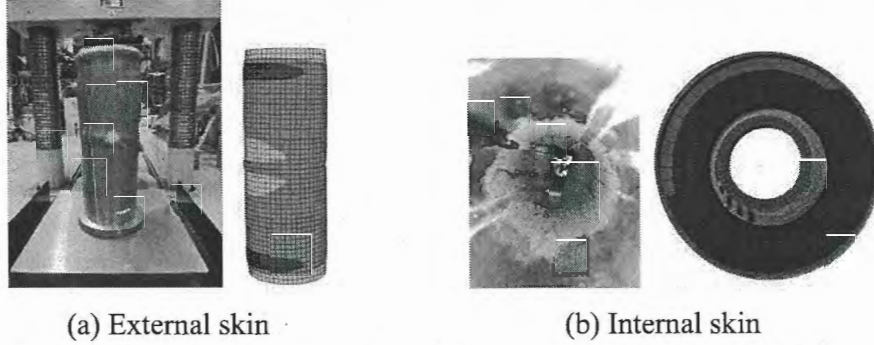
The typical failure modes of the specimen C4-83-0.46-6.0-1
